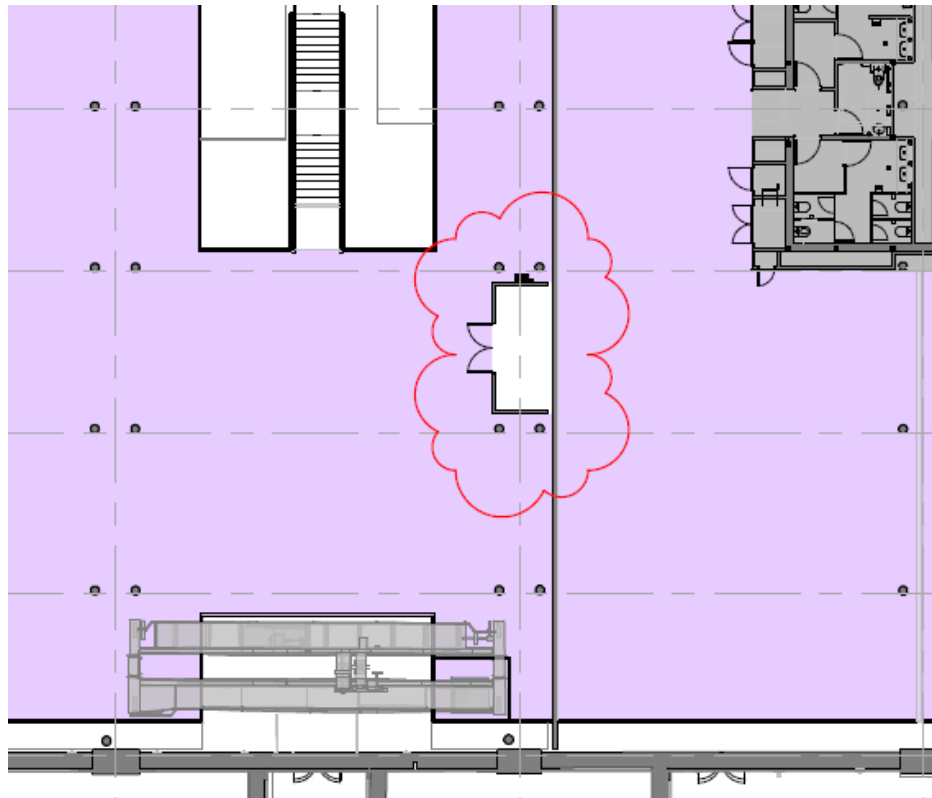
Proposed Plant Room (Source: Sissons, 2020)
